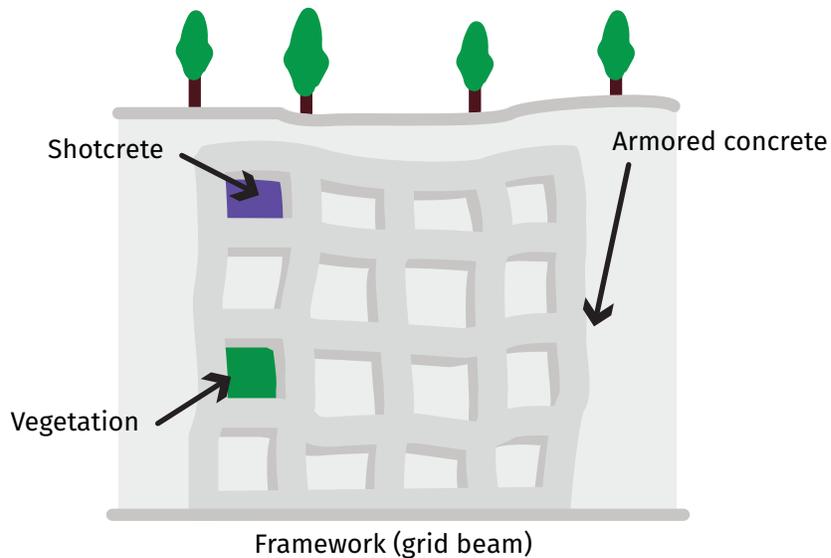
Rock Bolting and Shotcrete for Slope Reinforcement for Mountainside Fall or Collapse
